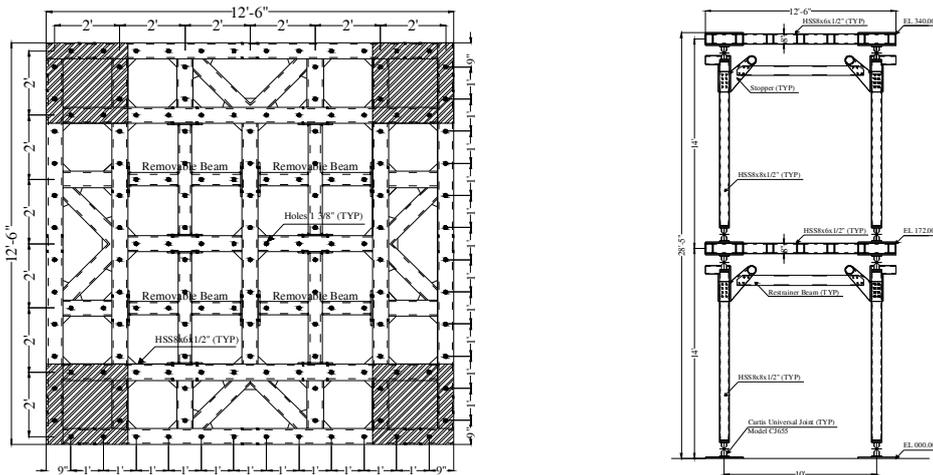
Plan view and elevation UB-NCS (1' = 0.3048 m).
